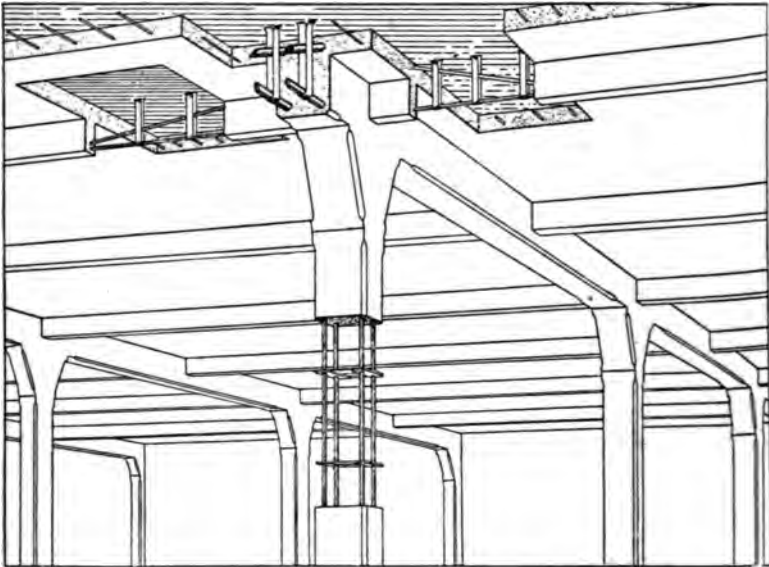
Typical Column and Floor Construction by Hennebique System.
